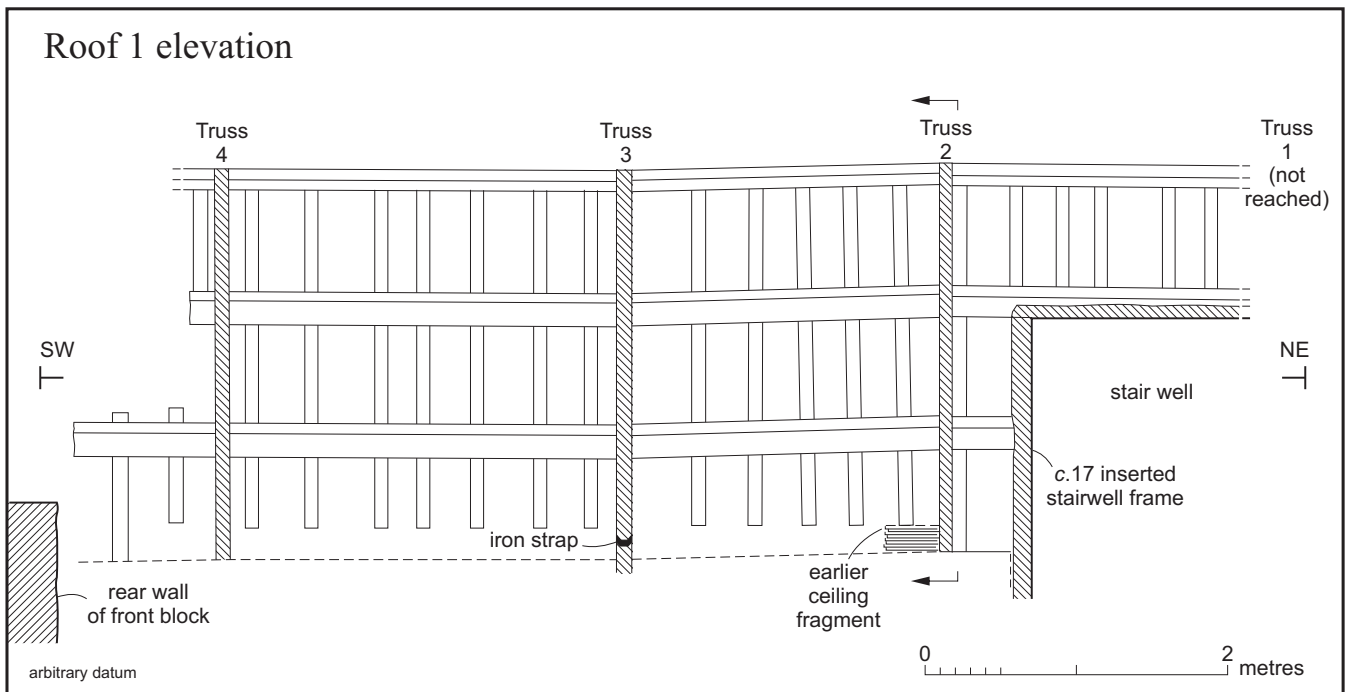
Measured elevation of SW slope of Roof 1 (minor flaws and distortions of timbers not shown).
